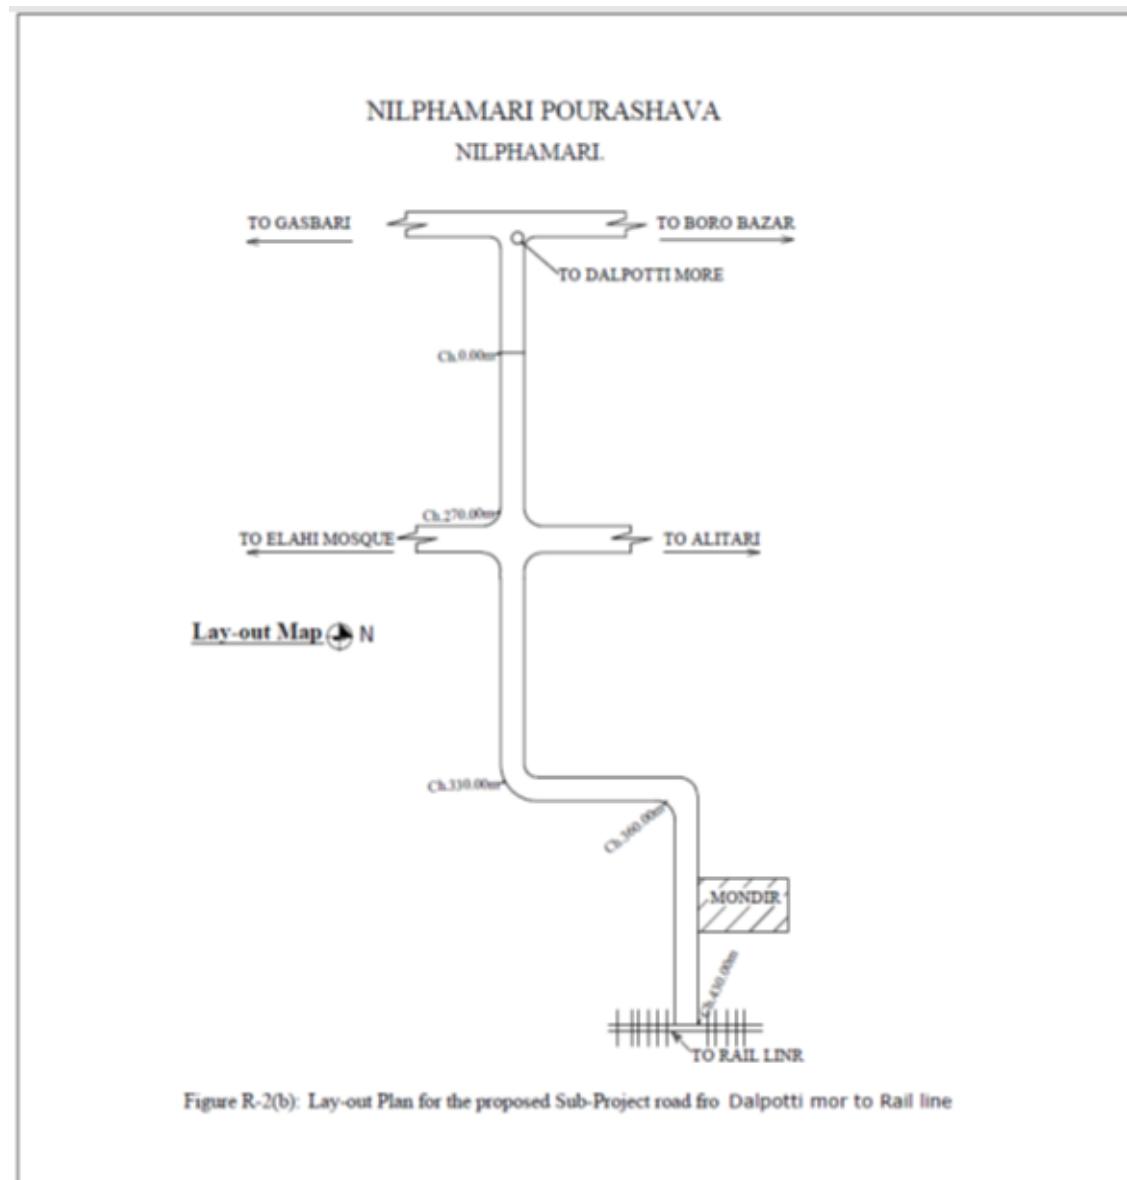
Layout Plan for the Proposed Subproject area from Dailpotti Mor to Rail Line
